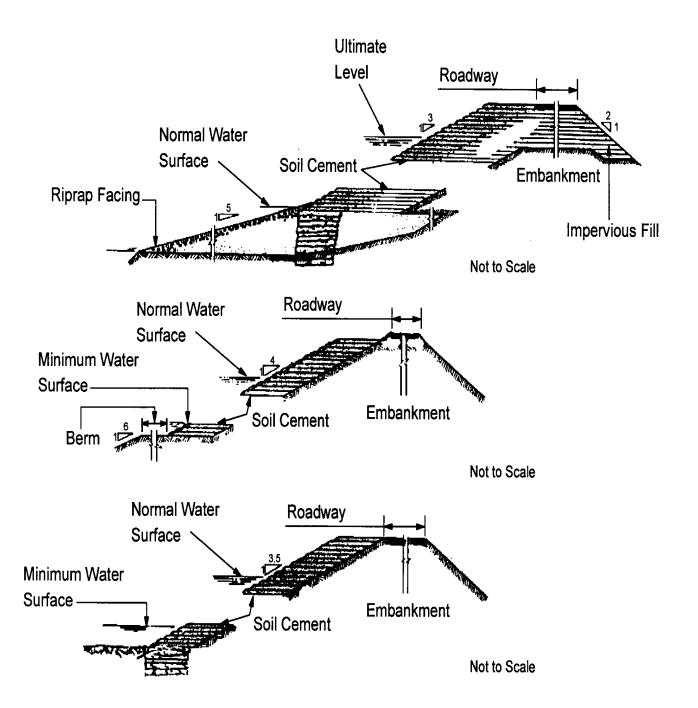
Details and Dimensions of Three Soil-Cement Facings
